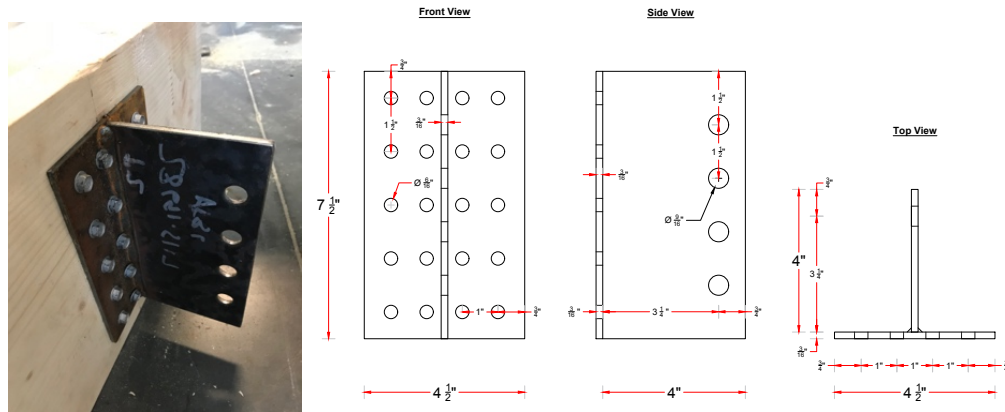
Image and geometry of T-shaped welded steel connection.
